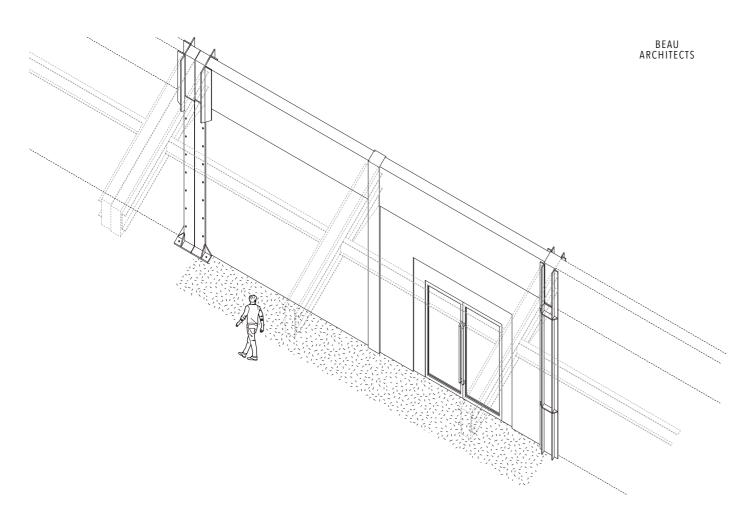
PLACING WALLS INBETWEEN COLUMNS
